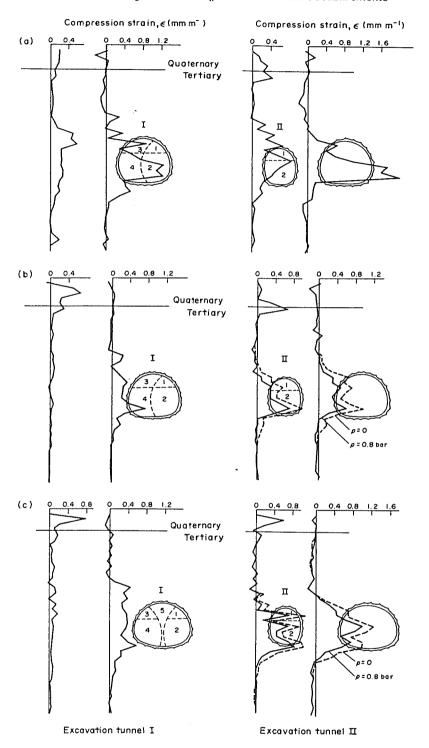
Strain distribution  $\varepsilon$  caused by the excavation of tunnels I and II: (a) measuring section MQ 21, atmospheric conditions, (b) measuring section MQ 20, compressed air, and (c) measuring section MQ 19, compressed air
